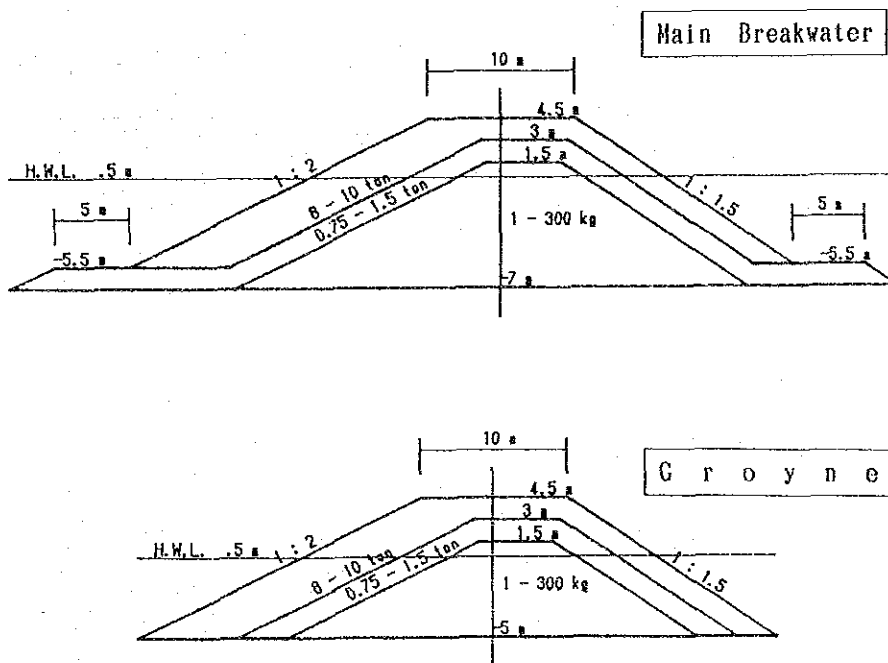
Basic Cross-sections Examined in the Model
